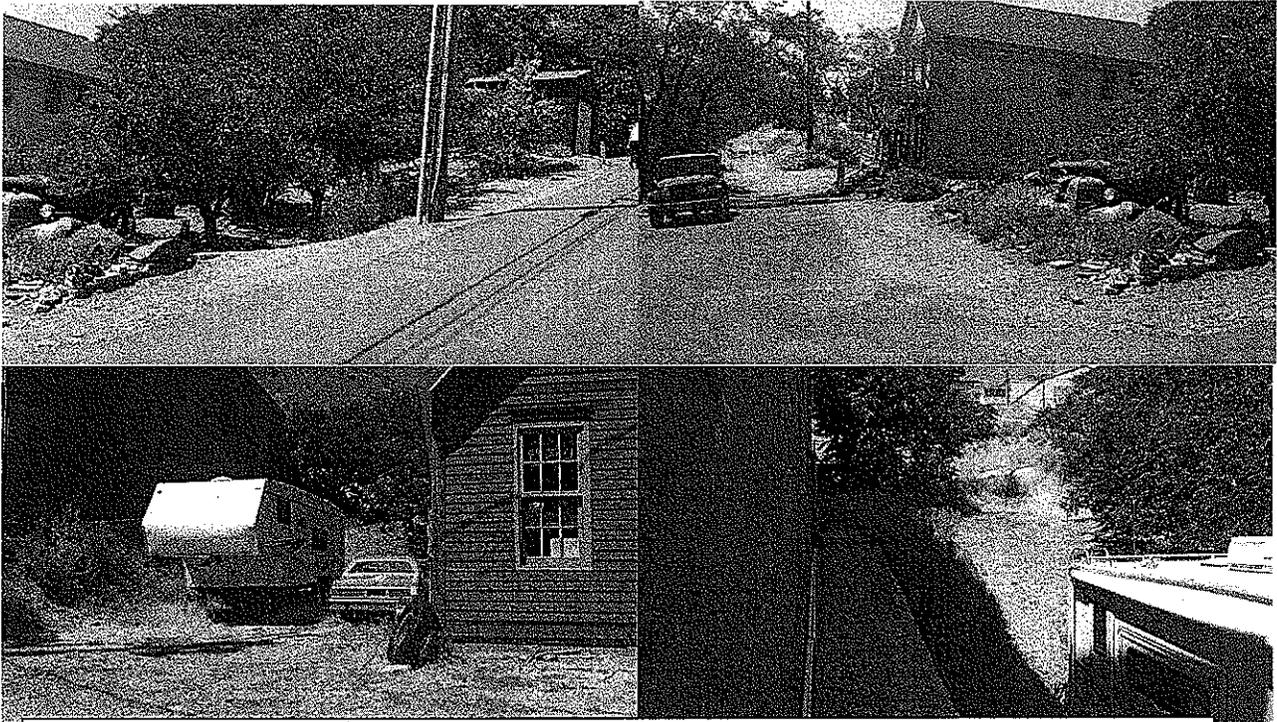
Site Photos. Top left, looking west from Washington St, just by E St. Top right, looking south from Washington St and E St. Bottom left, looking East from E St. Bottom right, looking west from south east property corner.
